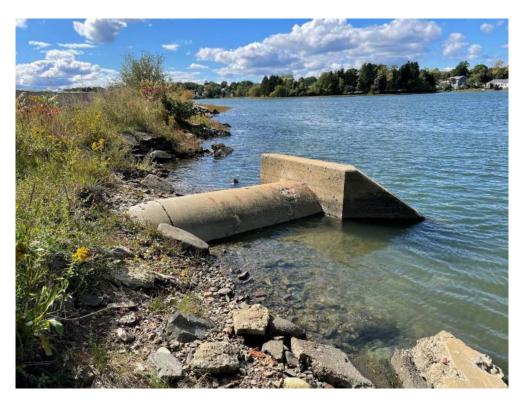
Existing outfall headwall, exposed 48" RCP pipe, and tidal embankment looking west at approximate high tide. Taken 9/28/22
